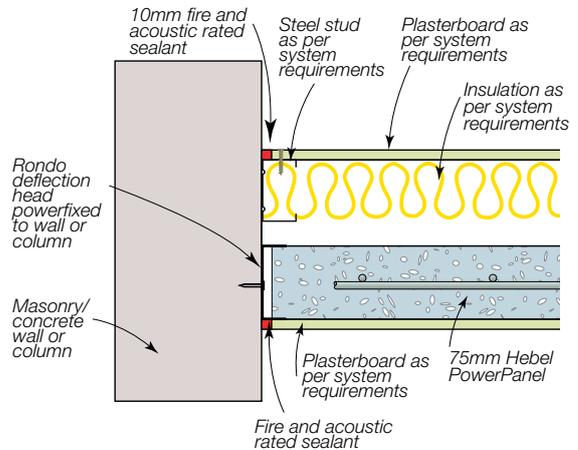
Wall to column junction - Intertency Walls or Common Walls Option 1 for H < 3100mm
